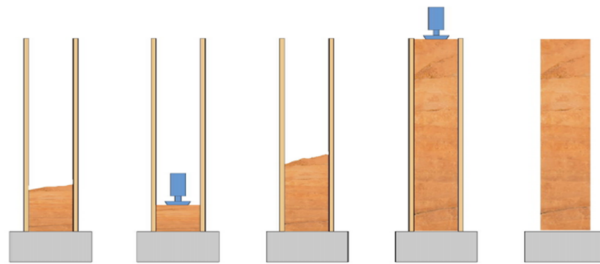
Step-By-Step of Rammed Earth Wall Construction
